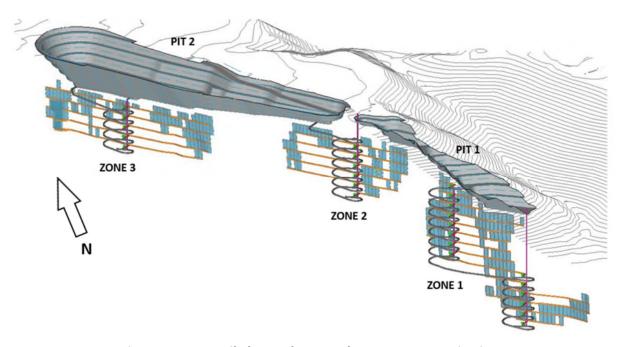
Vertikalny Underground Zone 1-3 Isometric View
